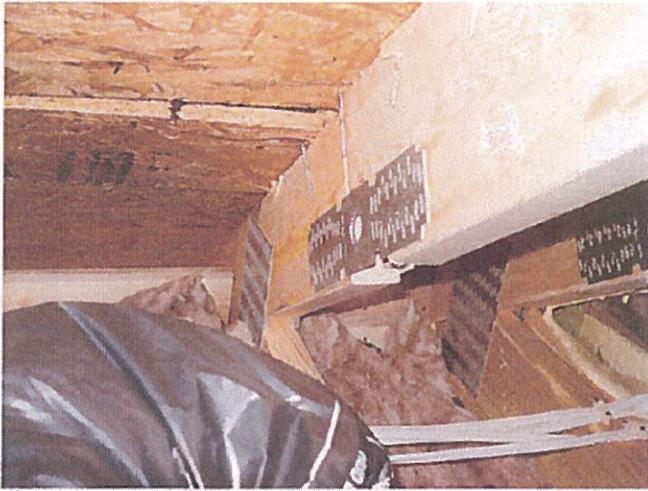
" third floor, no thermal envelop, no headroom, unguarded opening. Inconsistent with Approved House Document. House as built is a 2 story cape.
